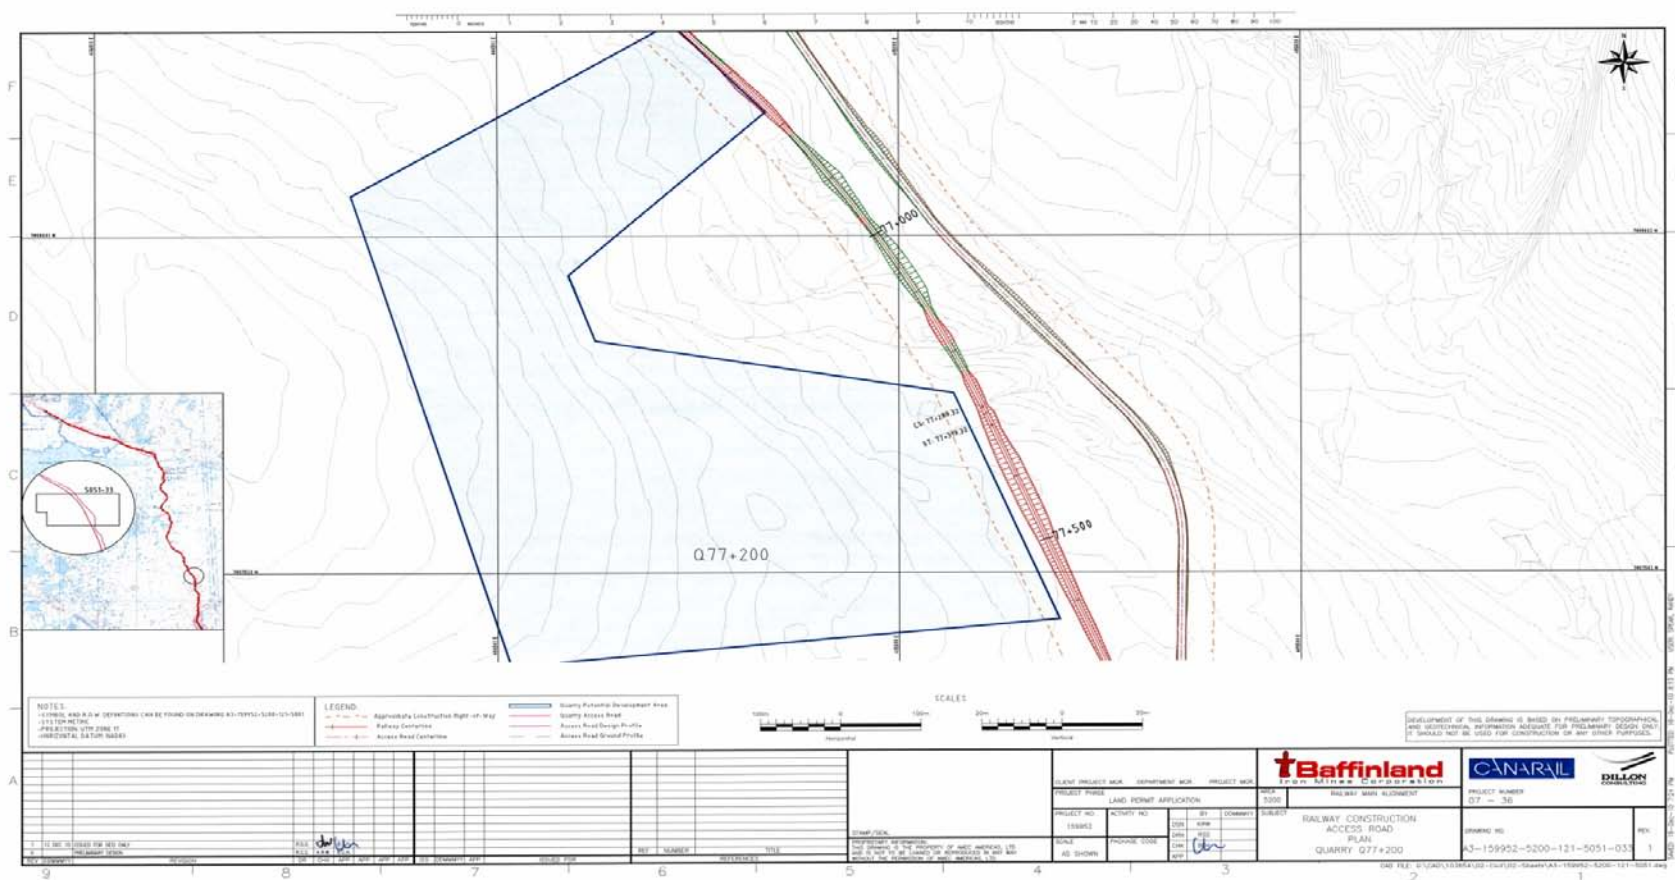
1: Quarry Q77 + 200 - Site Layout
